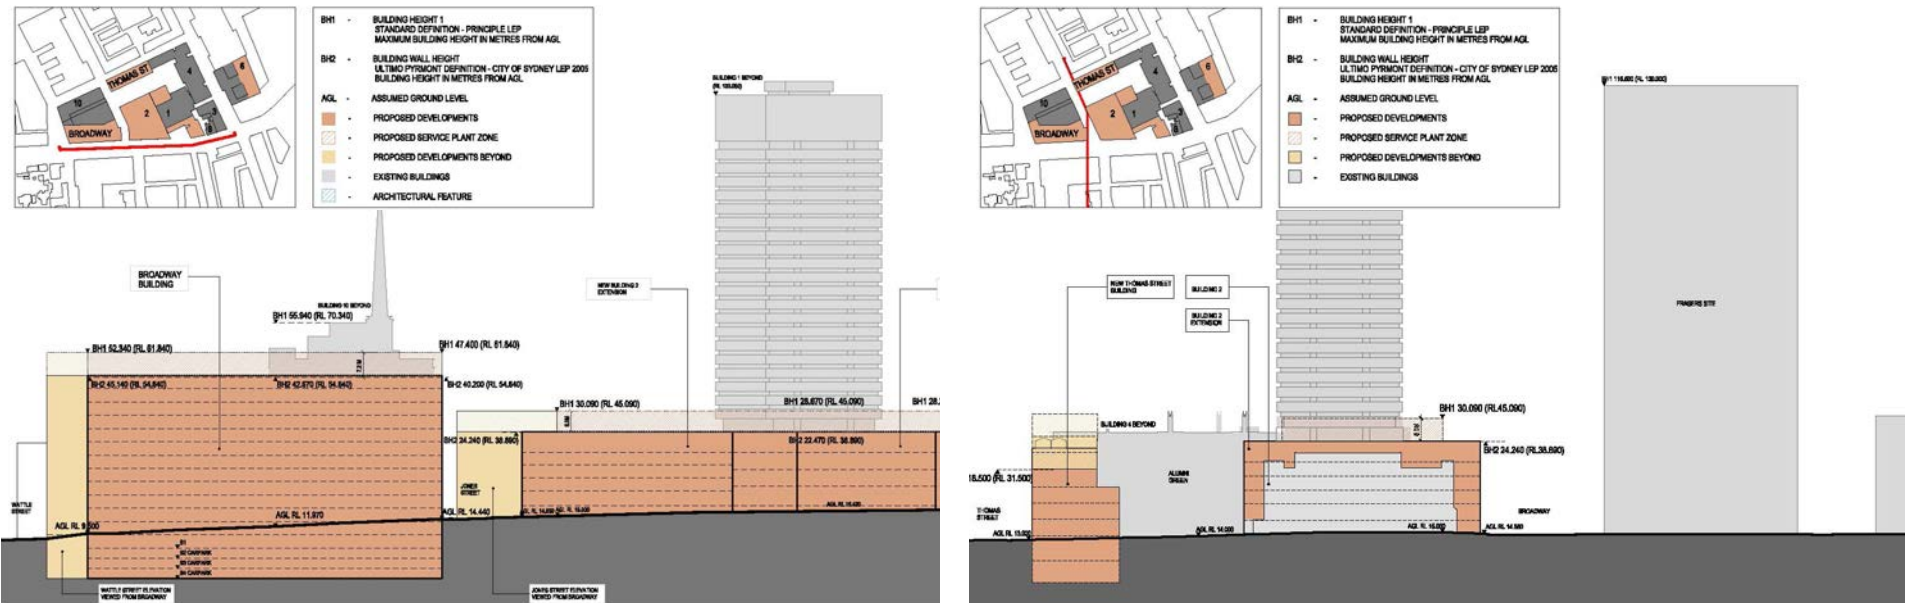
South elevation – Broadway (Source: BVN and DCM) Figure 3 – East elevation – Jones Street (Source: BVN and DCM)
